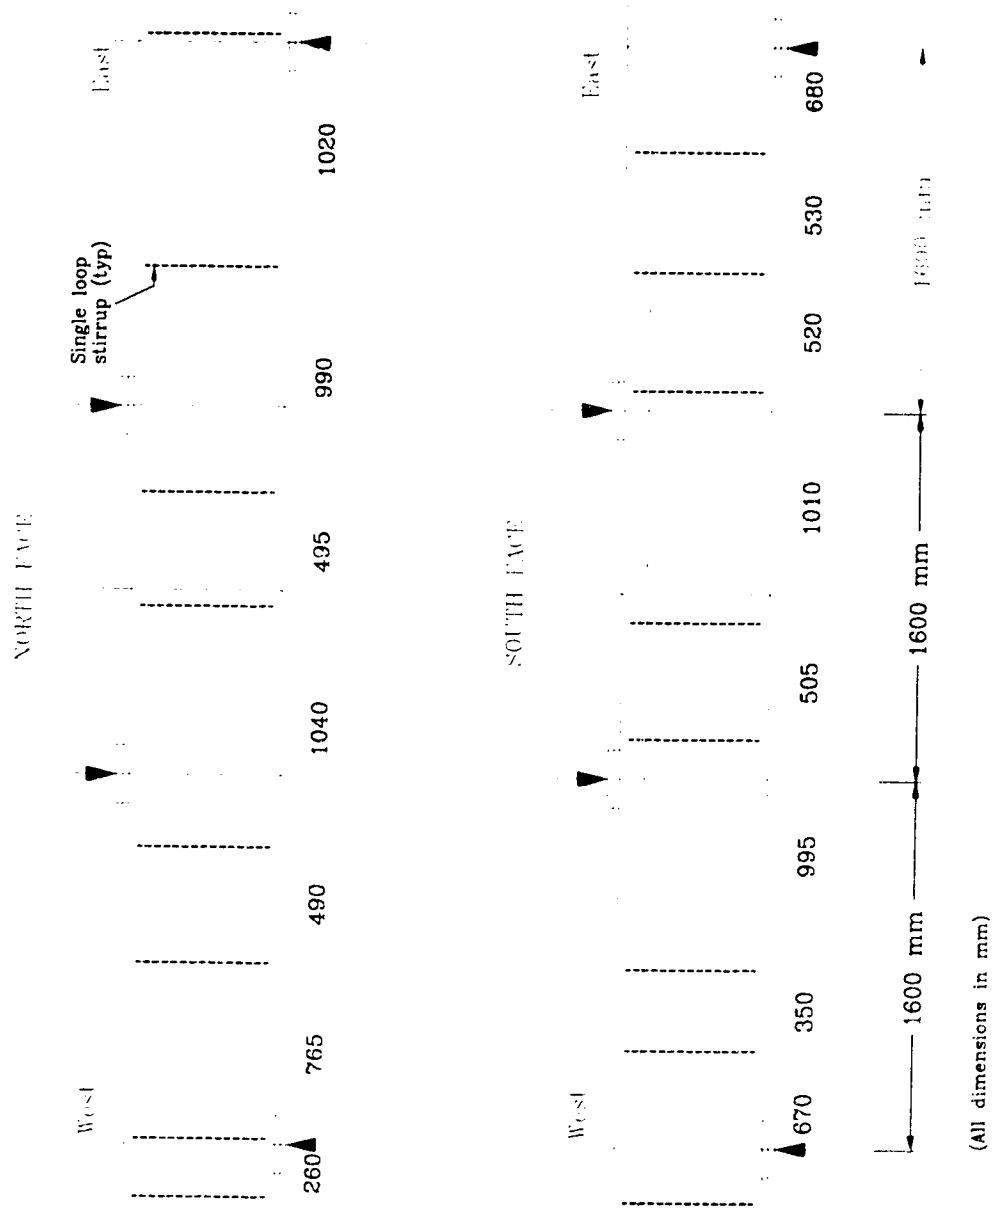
Girder 2 - Test set-up and stirrup locations
